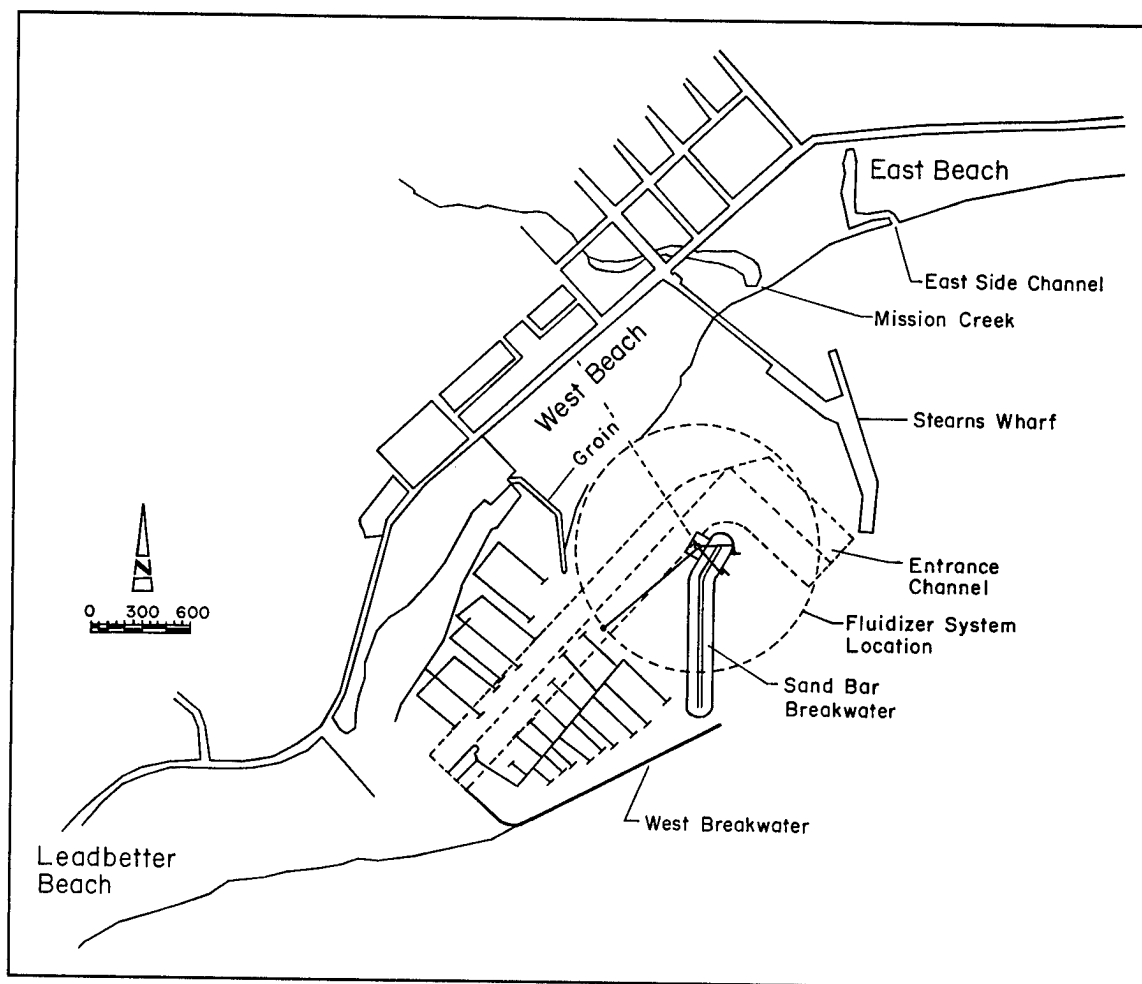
Location of fluidizer system using the fixed bypass plant alternative showing general location
